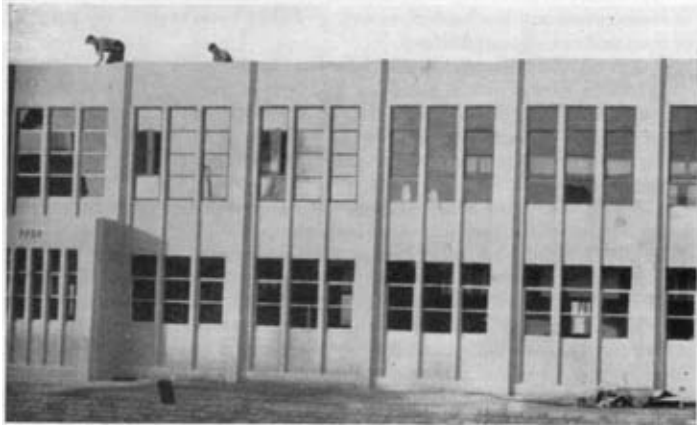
A pre-cast concrete building treated with silicones and rendered water repellent.
